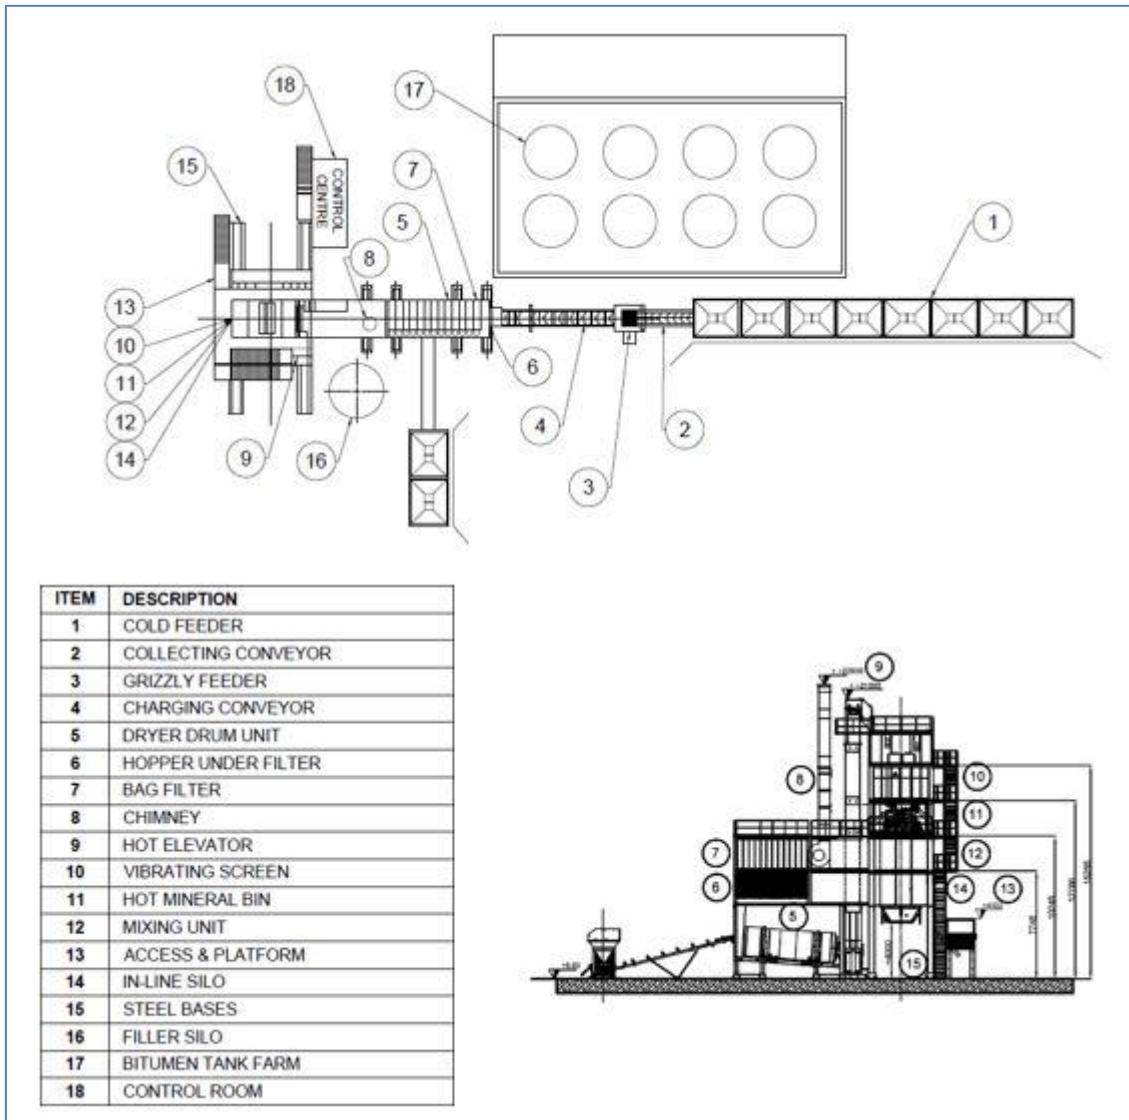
Plan and elevation view of the proposed asphalt batch plant
